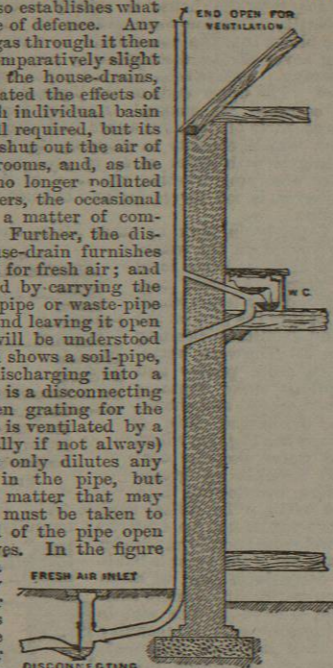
House-Drain properly disconnected from sewer, and ventilated.
